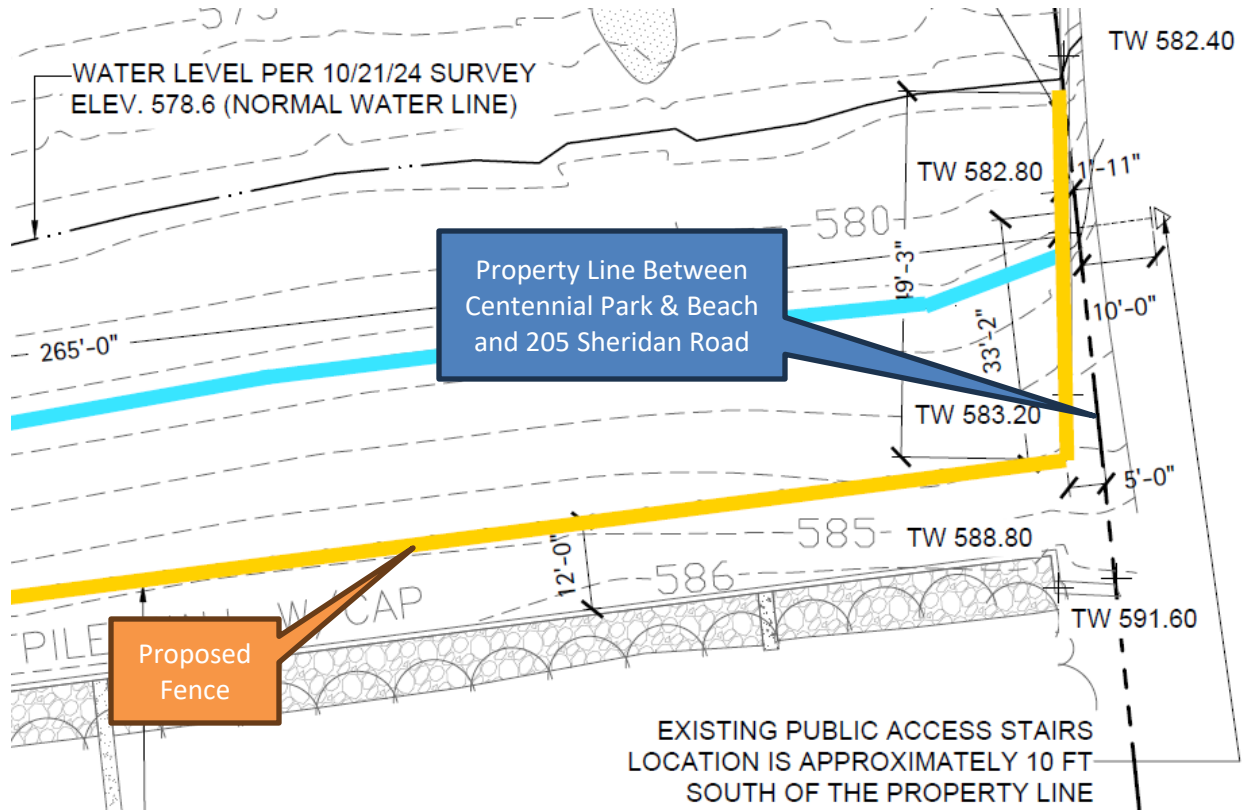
New Plan - South and West Portion of Proposed Fencing (Excerpt of Sheet L2.0)
